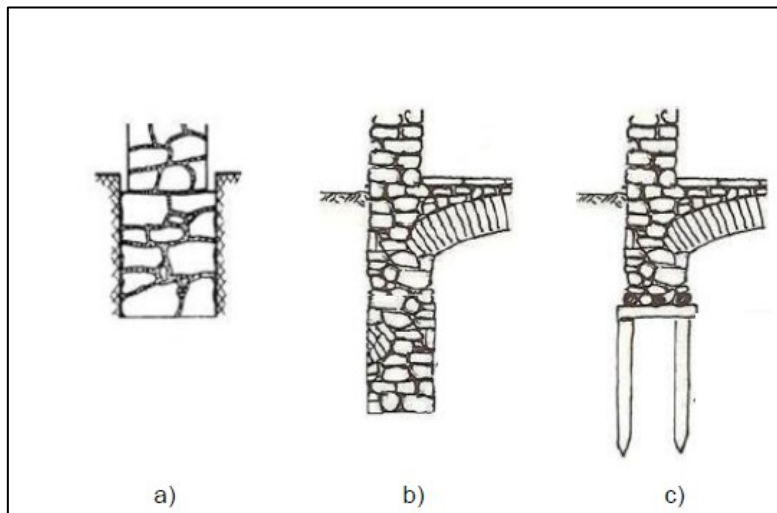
a) direct foundation b) semi-direct foundation c) semi-direct foundation with timber piles (Typical types of foundation for a Pombalino Building (Image from (Simões & Bento, 2012))
